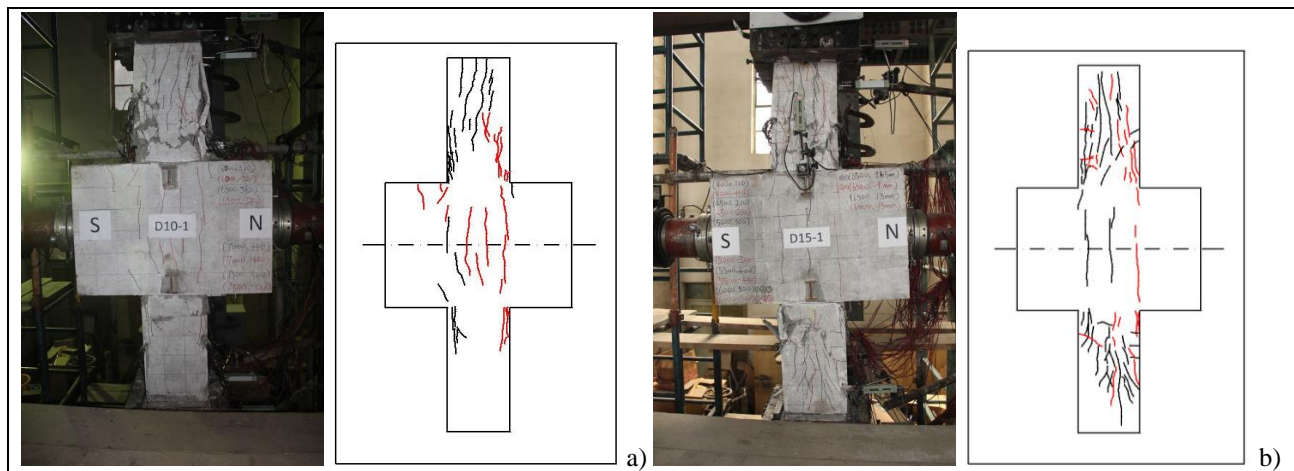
Phase 2: Crack distribution and failure modes of specimens: a) Specimen D10-1; b) Specimen D15-1.
